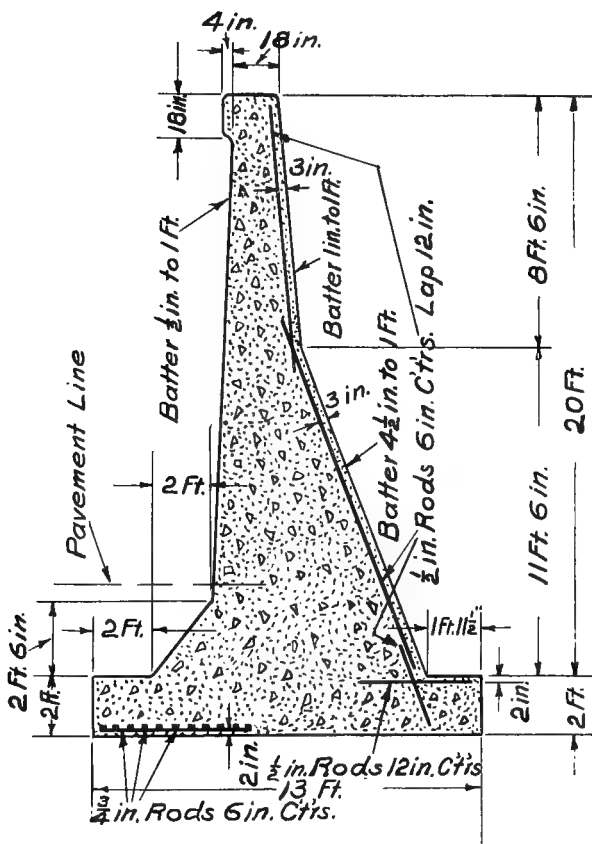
CROSS SECTION TYPICAL RETAINING WALL, C., B. & O. R. R.
